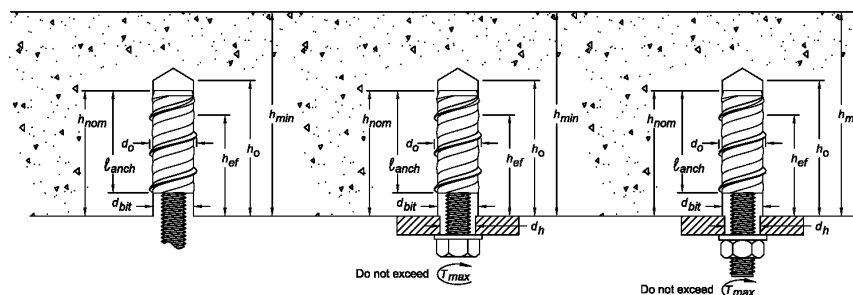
SNAKE+ SCREW ANCHOR INSTALLED WITH STEEL INSERT ELEMENT
